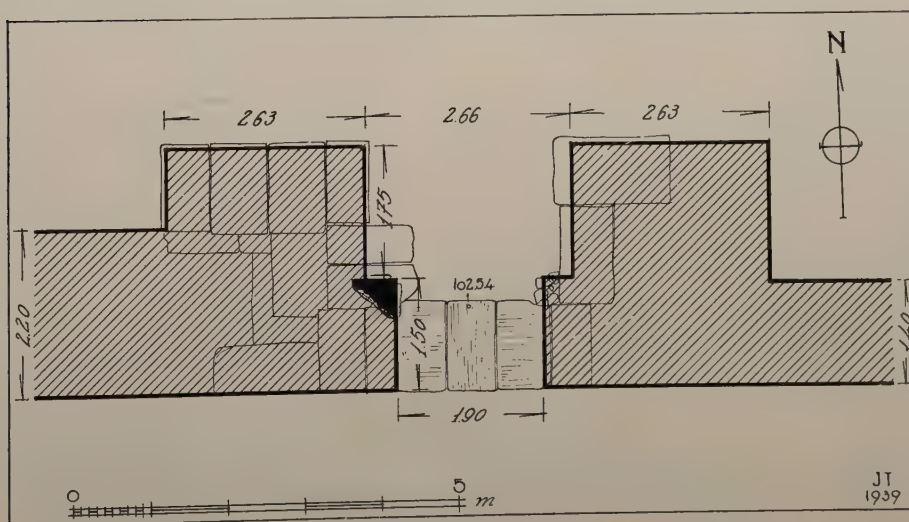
Postern in the White Poros Wall Near the Southwest Corner
